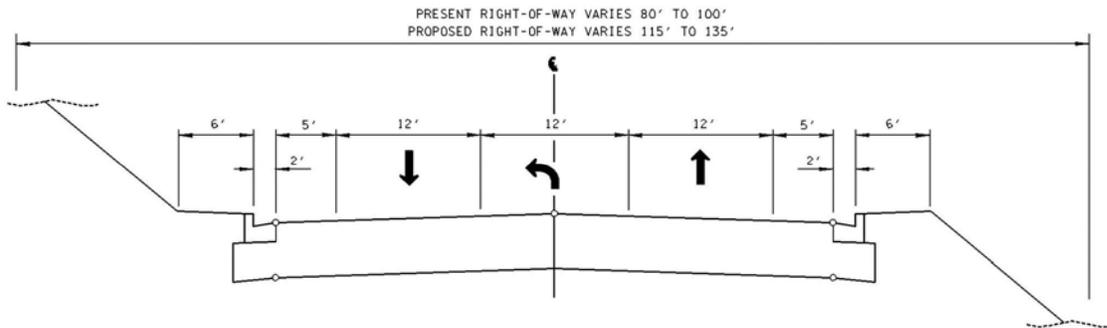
Center Turn Lane with Curb Typical Section
